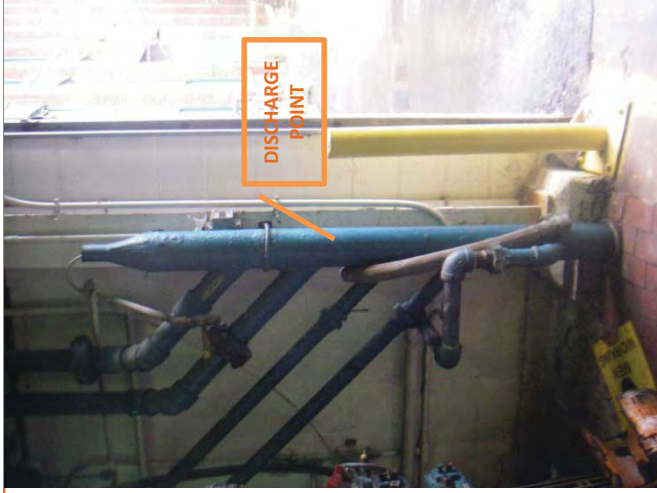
Building 2-A noncontact cooling water discharge point to Outfall 004 (south of Building 2 entrance)
